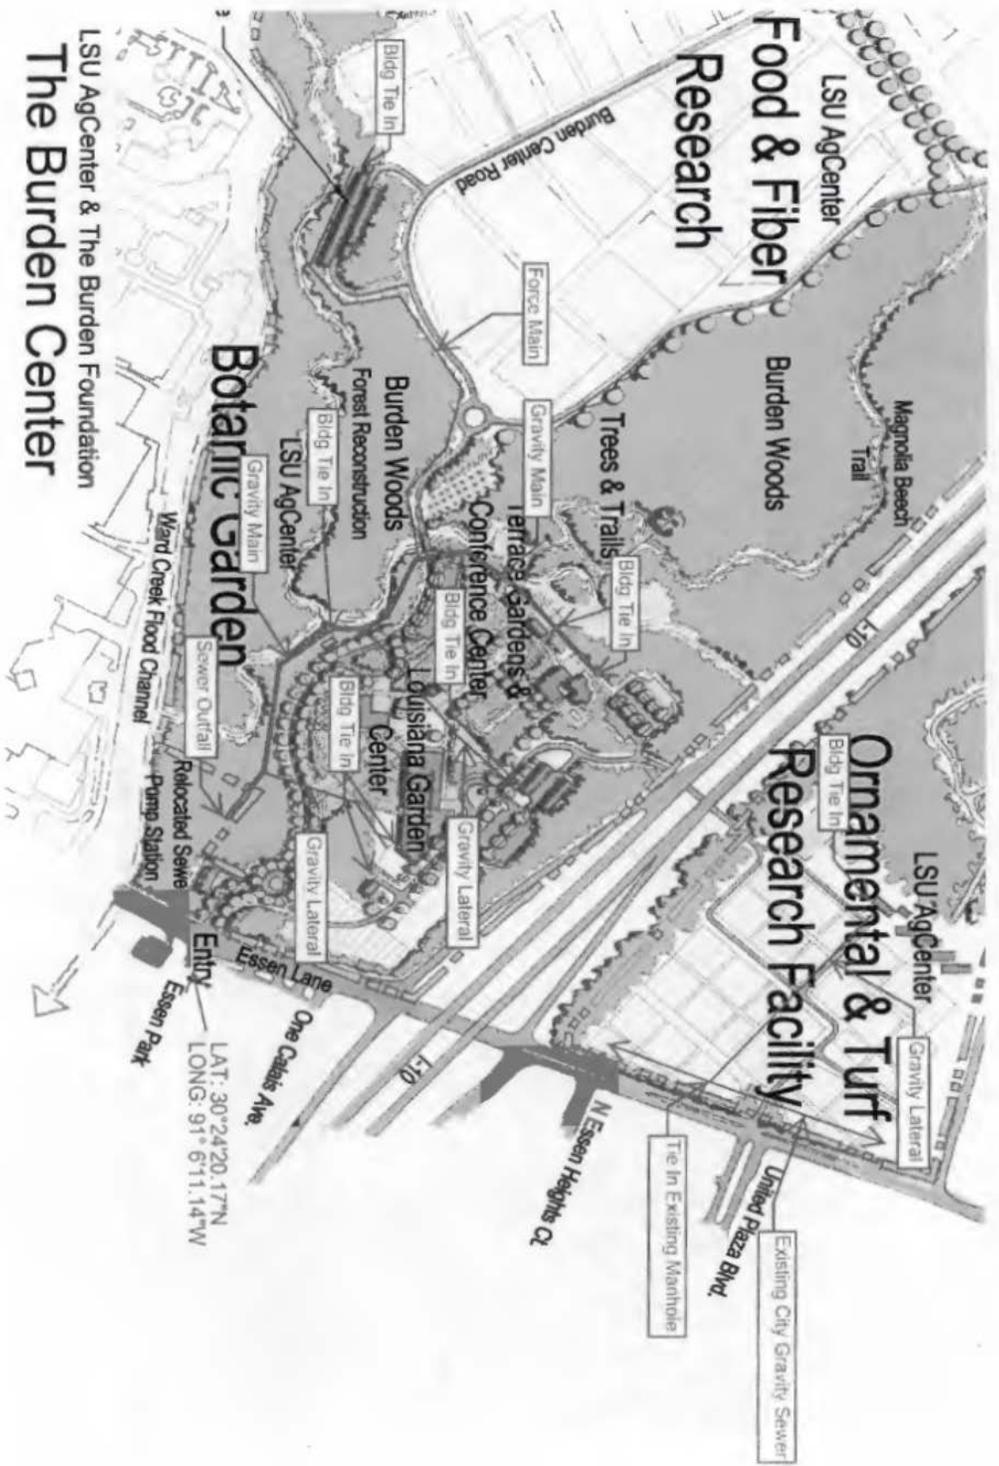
Facility Sewer Collection System Burden Center Site at Burden Center 4560 Essen Lane, Baton Rouge, LA 70809
